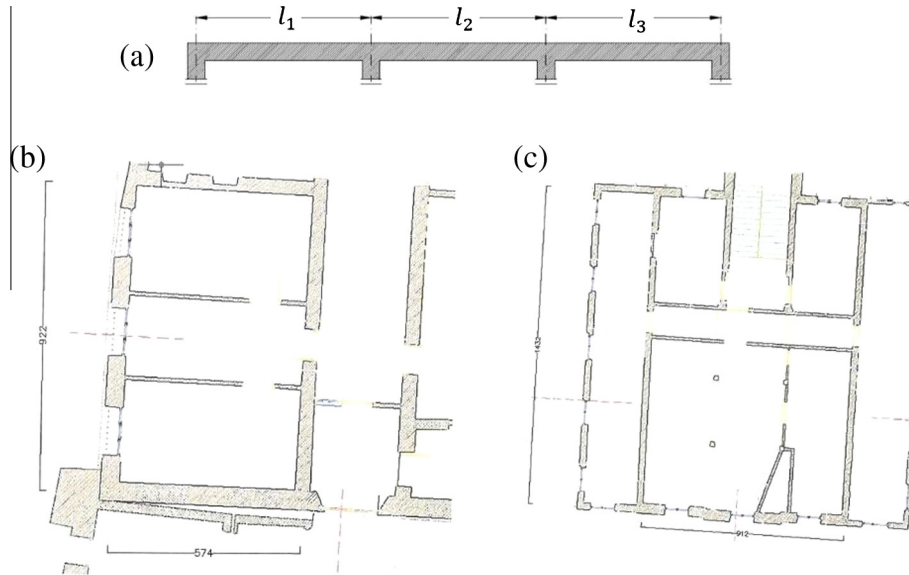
(a) Non-supported wall length ($l_i \leq 5.5$ m), (b) View of non-supported wall lengths in normal storeys, (c) View of non-supported wall lengths in attic [33].
